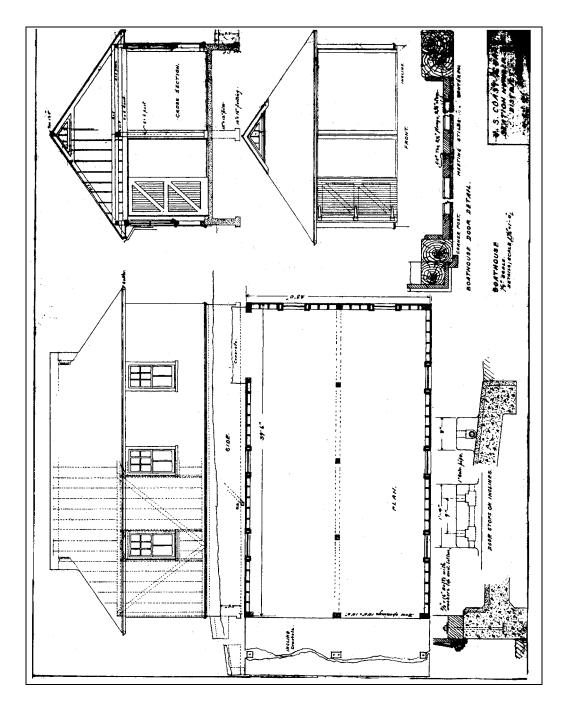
Siuslaw River Lifeboat Station, Boathouse Plan, October 1916. Source: U.S. Coast Guard Civil Engineering Unit, Oakland, CA.
